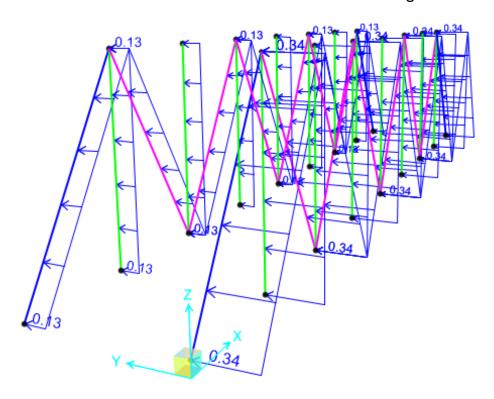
Forces acting on the lattice structure, CONDITION 2, CASE 3
